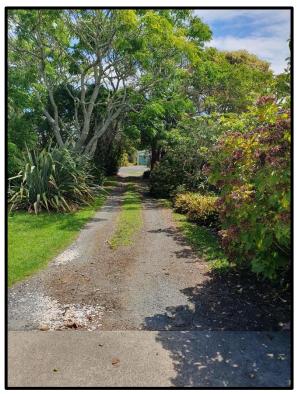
Existing internal driveway to the dwelling on 114 Donald Road.
